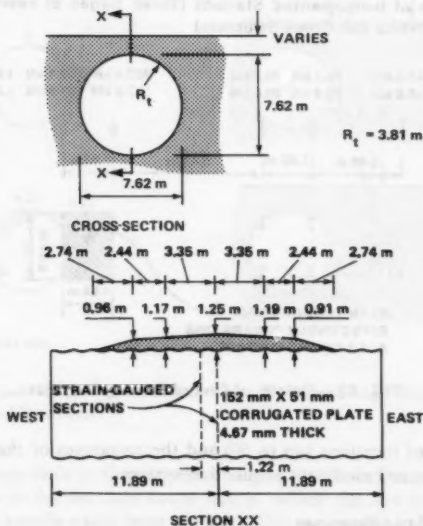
Details of White Ash Creek Soil-Steel Structure
